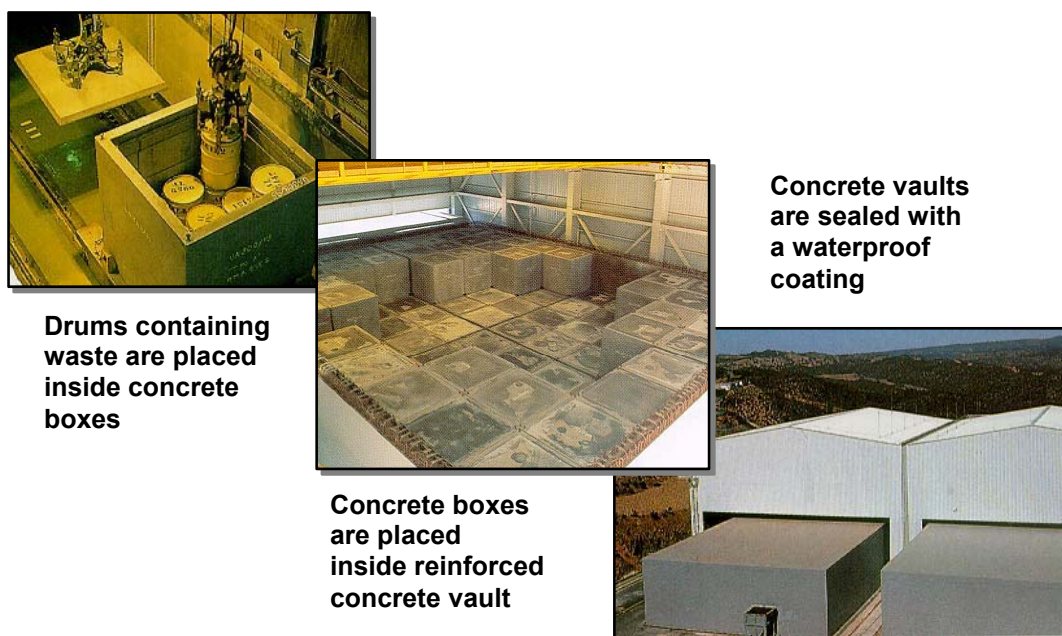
Multiple concrete barrier concept employed at the El Cabril radioactive waste disposal facility in Spain.
